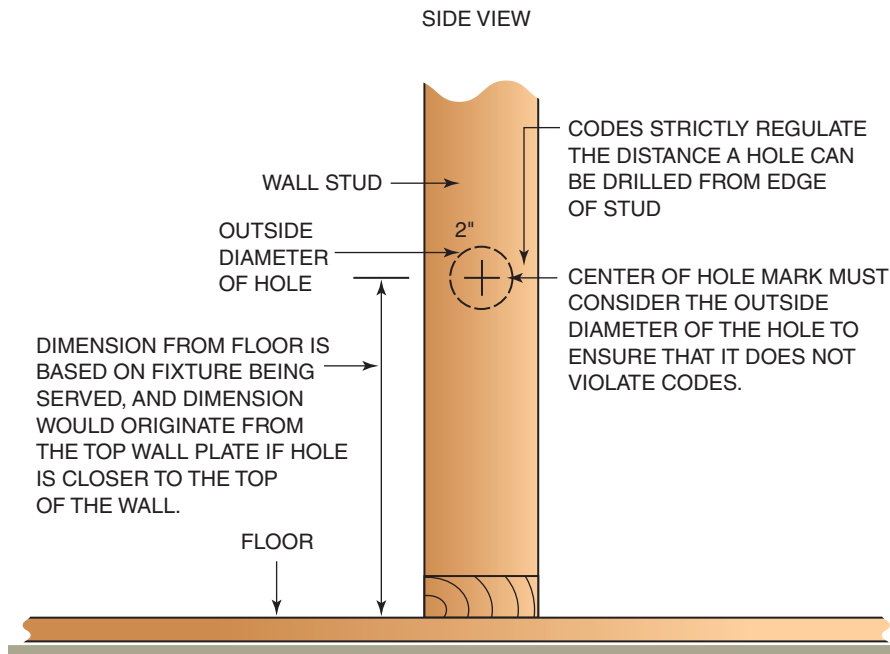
A wall-stud layout must be based on local codes pertaining to hole size and location.
